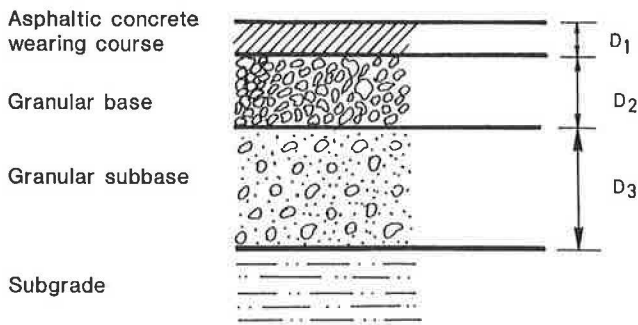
Typical four-layer system of flexible pavement tested in AASHO road tests.
